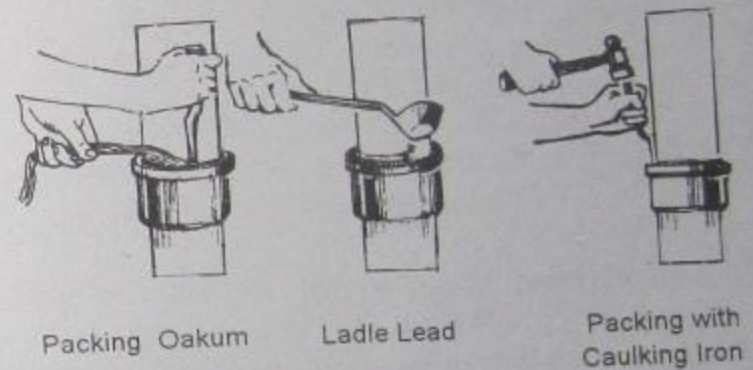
CALKING C.I. PIPE JOINTS
